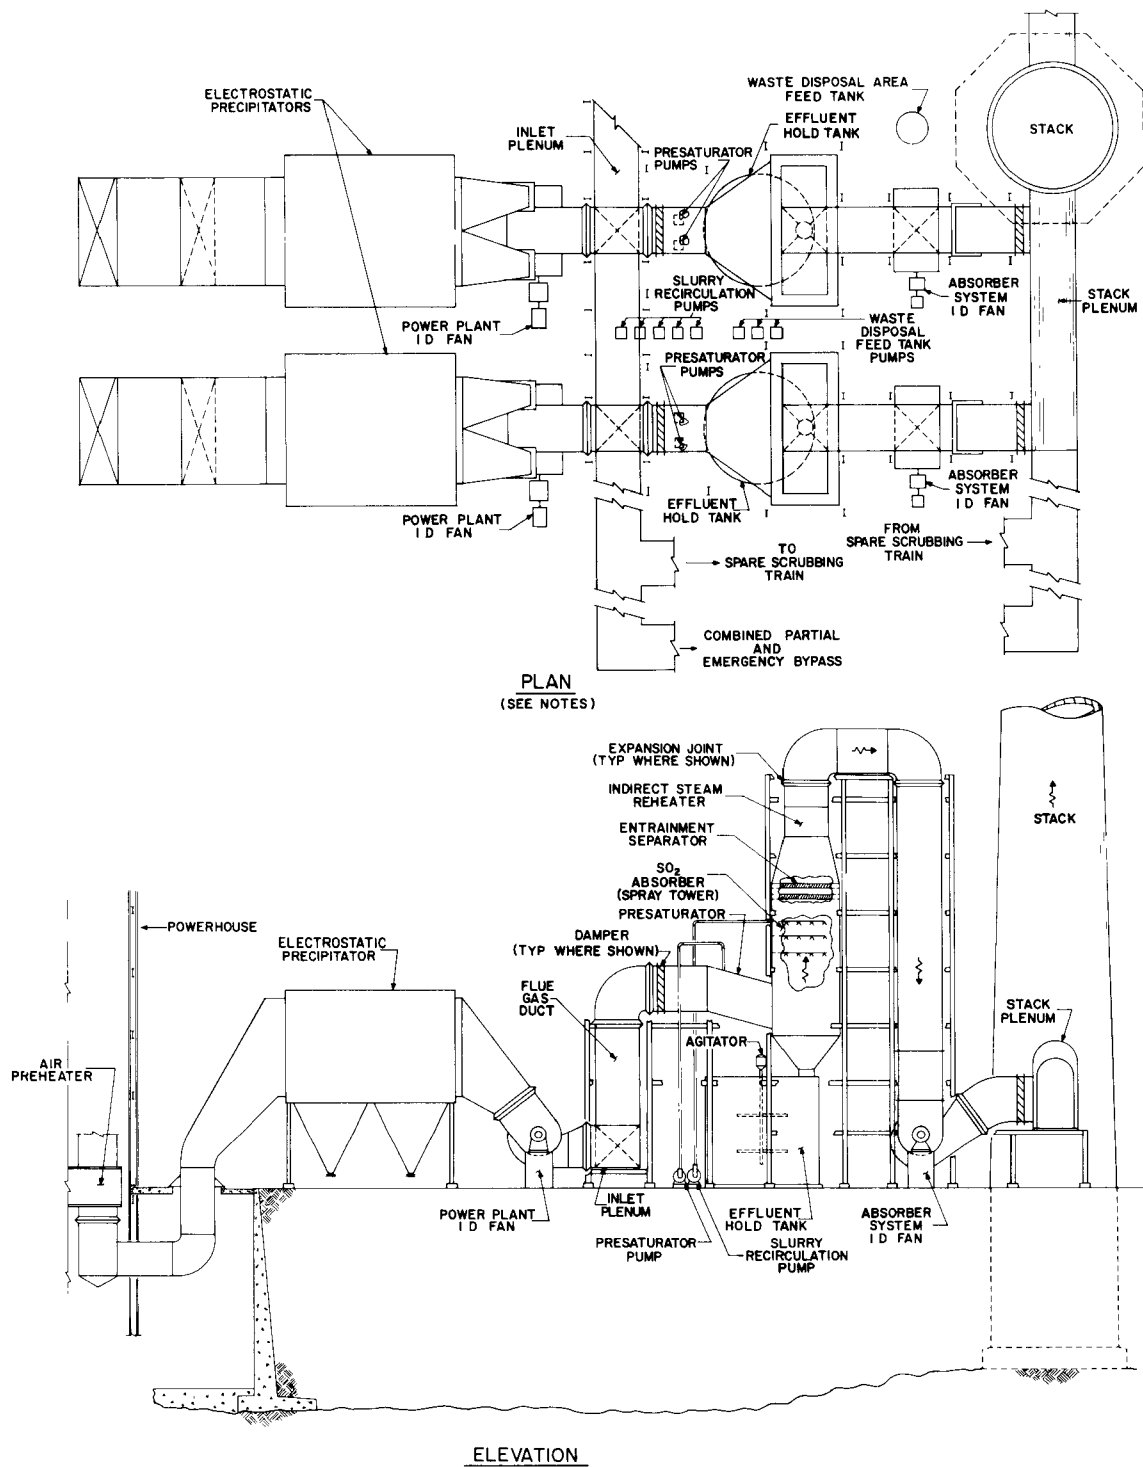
Plan and elevation for partial scrubbing with bypass duct.
